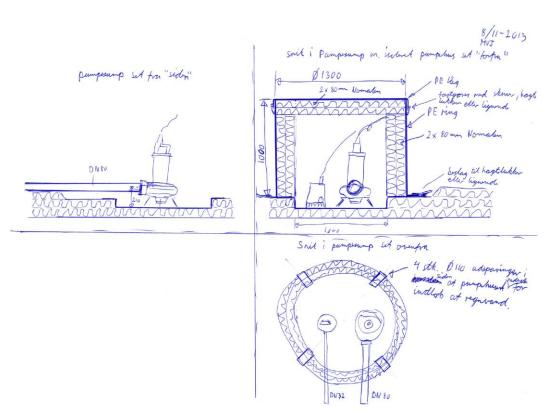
Example of a pump installation for rainwater handling on a pit heat storage.
